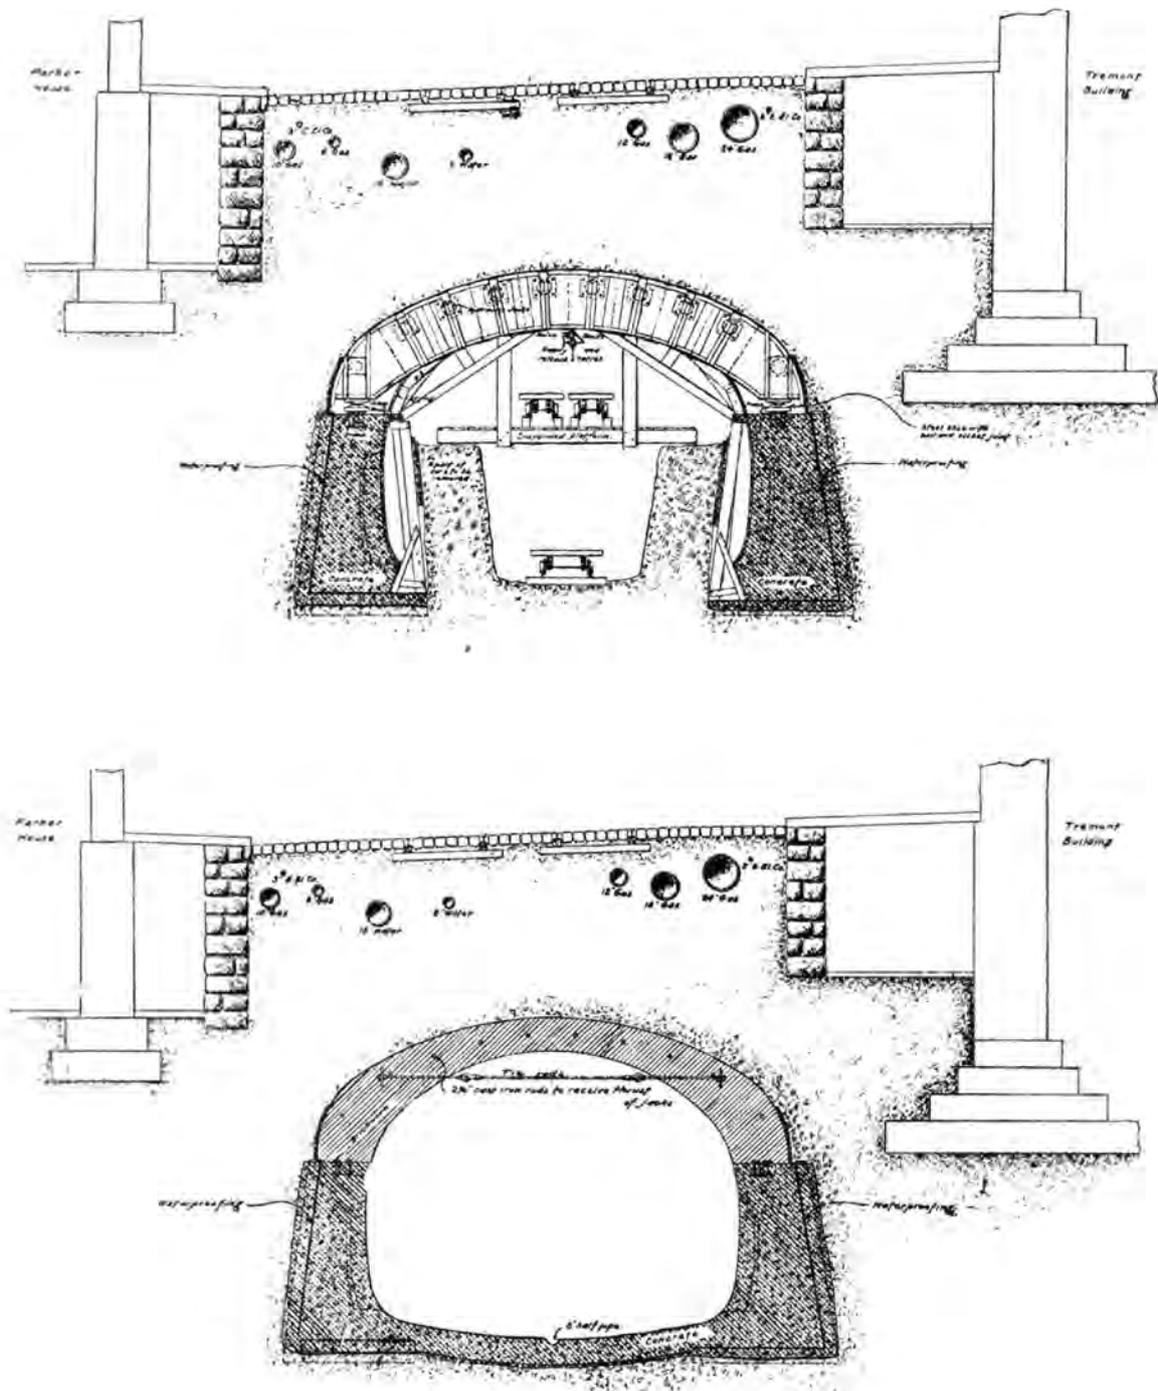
UNDERGROUND RAILWAY, BOSTON, U.S.A.
